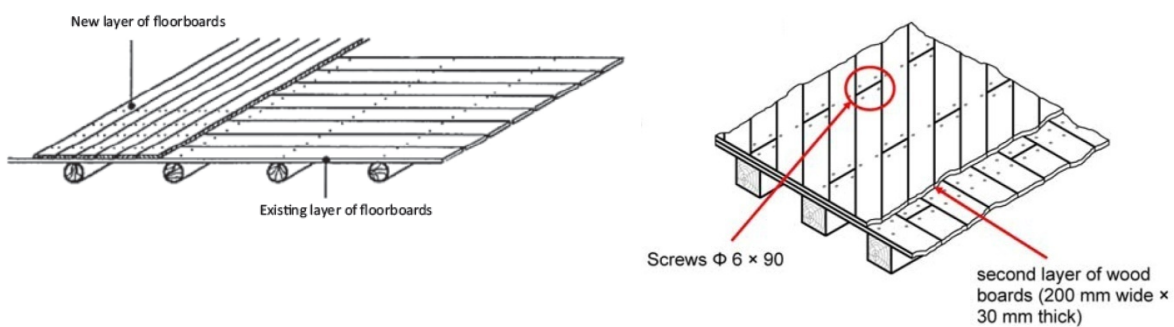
Orthogonal layer of floorboards over an existing structure [3][11].
